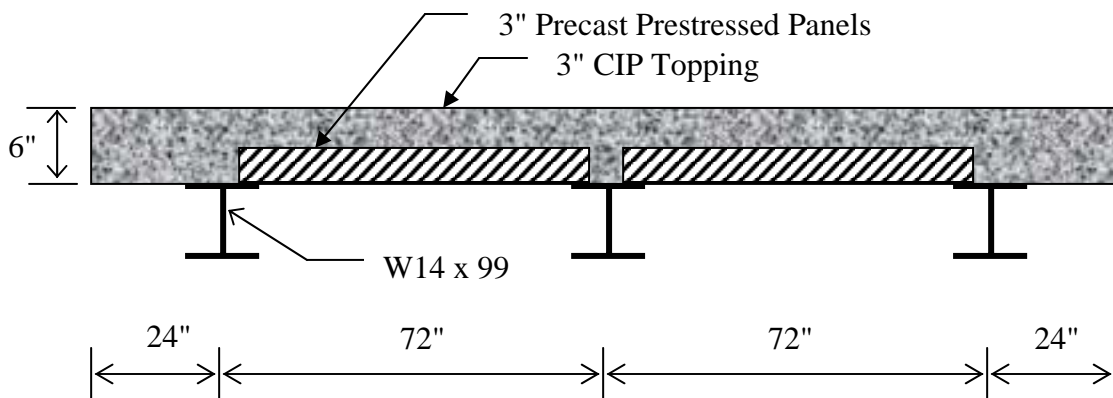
Cross-Section of Precast Prestressed Panel Deck with Cast-in-Place Topping
